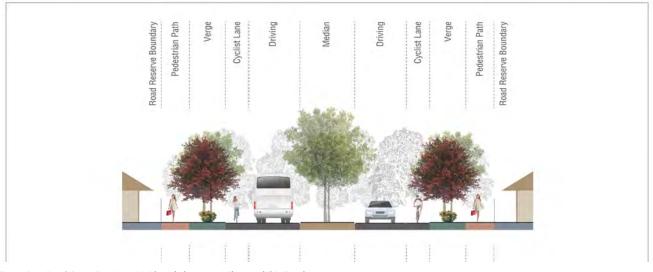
Road Cross Section - Maida Vale between Milner and Ibis Road
